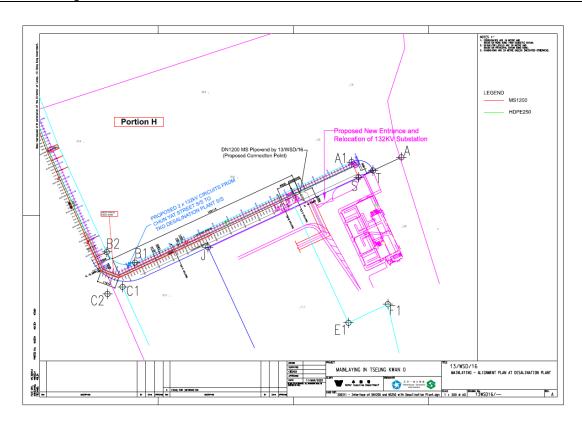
Location Plan for CH.CT 0+07 - 2+58
